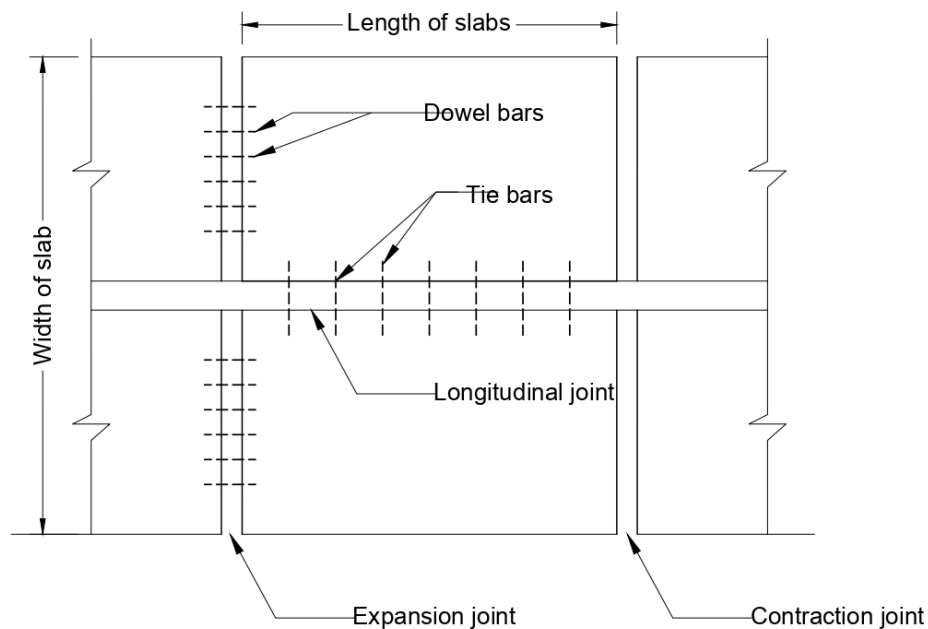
Lay-out of Joints in Cement concrete pavements
